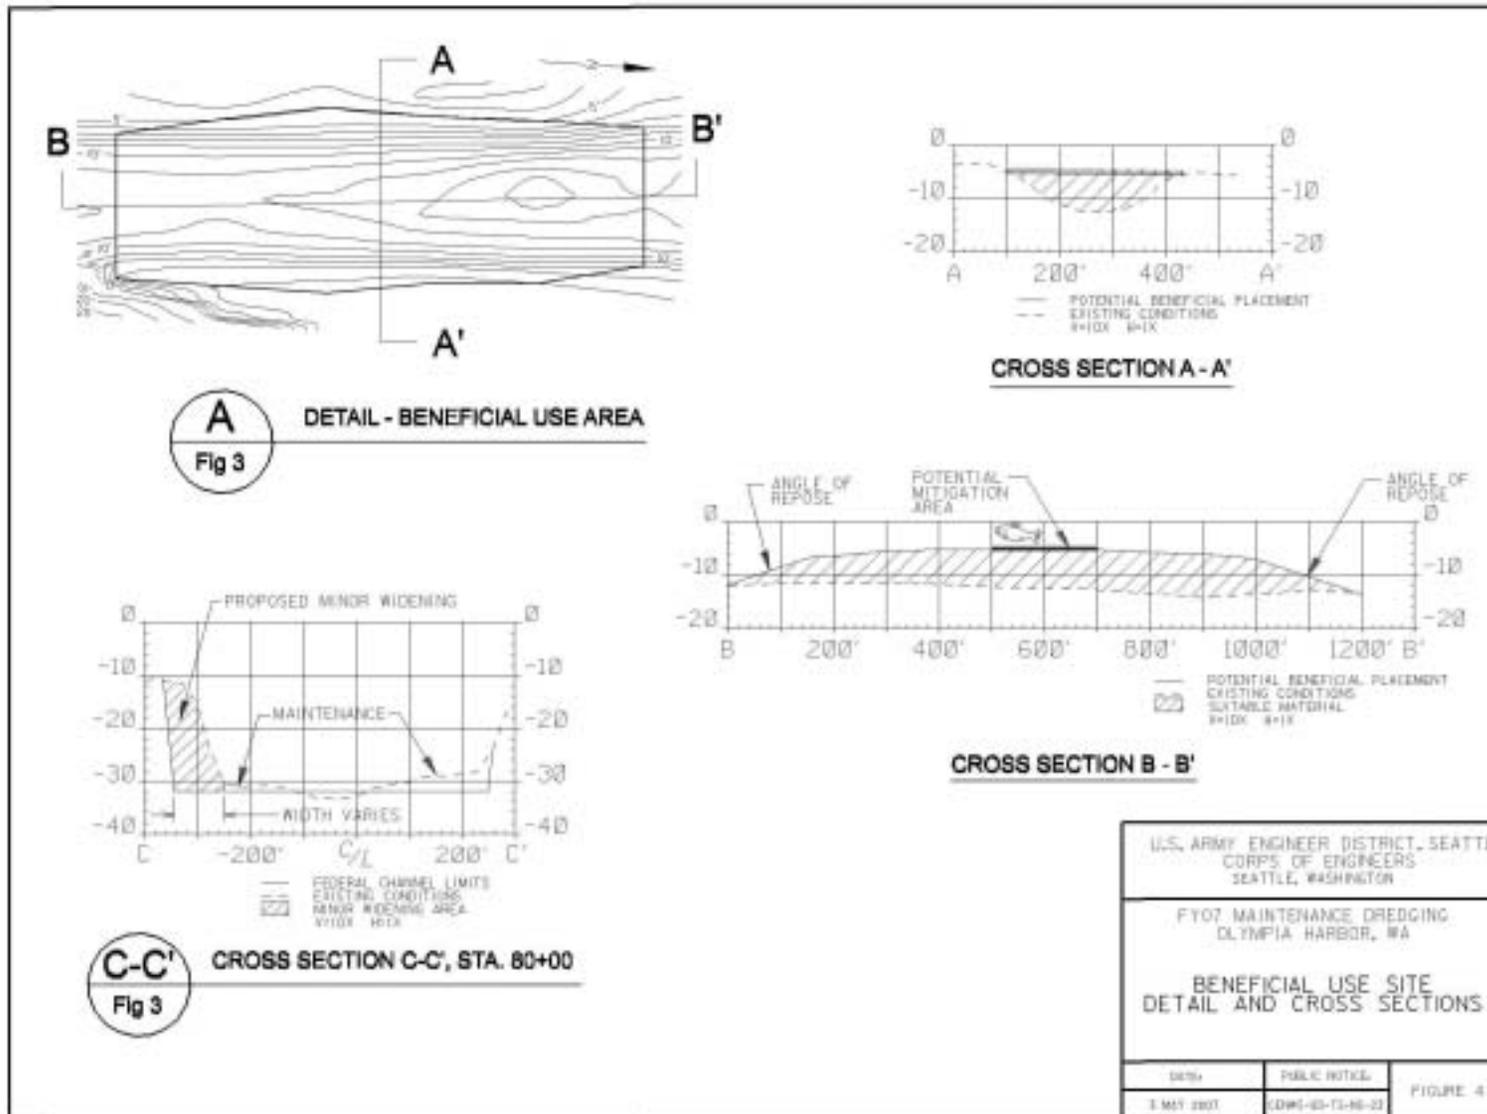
Detail and Cross-Section Views of Dredging and Beneficial Use Areas
